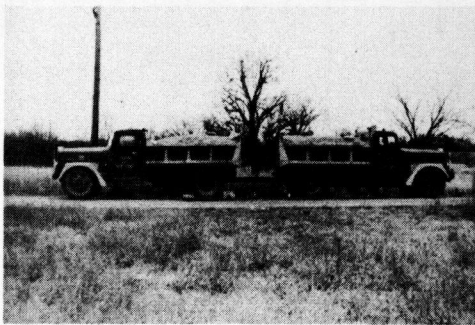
View of Loading Equipment Used During 1949 - Showing I-Beam Supported Beneath the Two Trucks - State of New York
